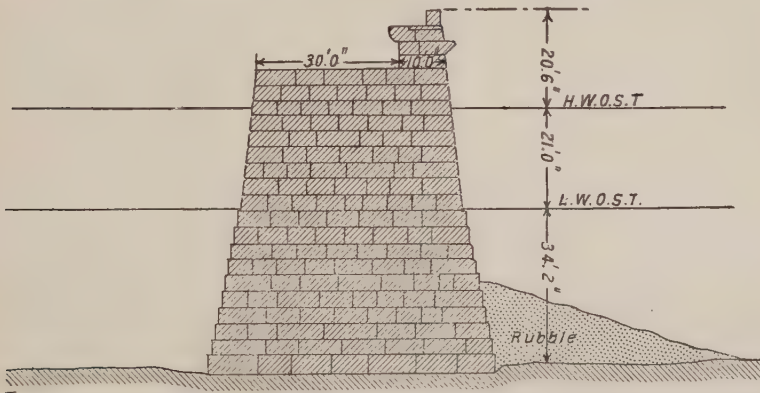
Section of Battery Pier, Douglas, I.O.M.
